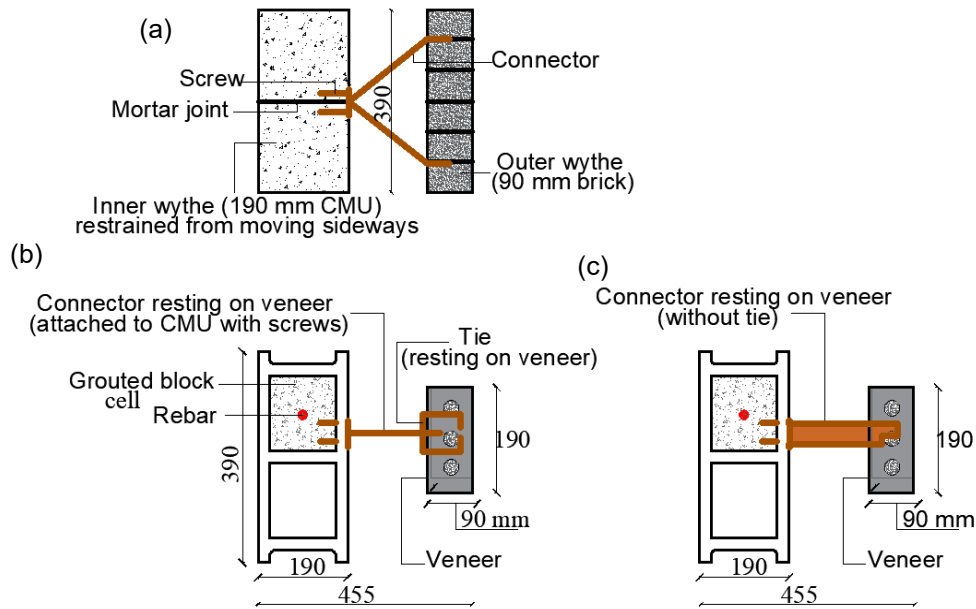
Specimen details (a) side view of inclined connector. Plan view of specimen with plate connector (b) inserted vertically (c) inserted horizontally (All dimensions in mm)
